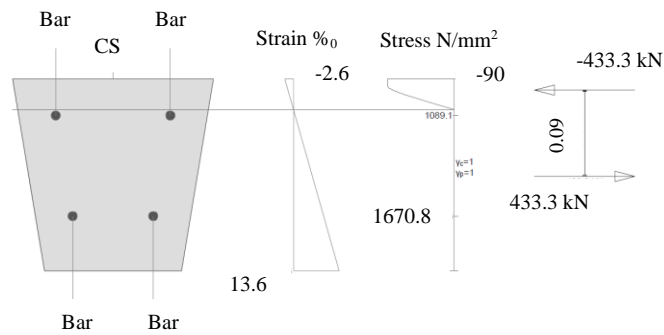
Cross-sectional strain-stresse on concrete and steel.
